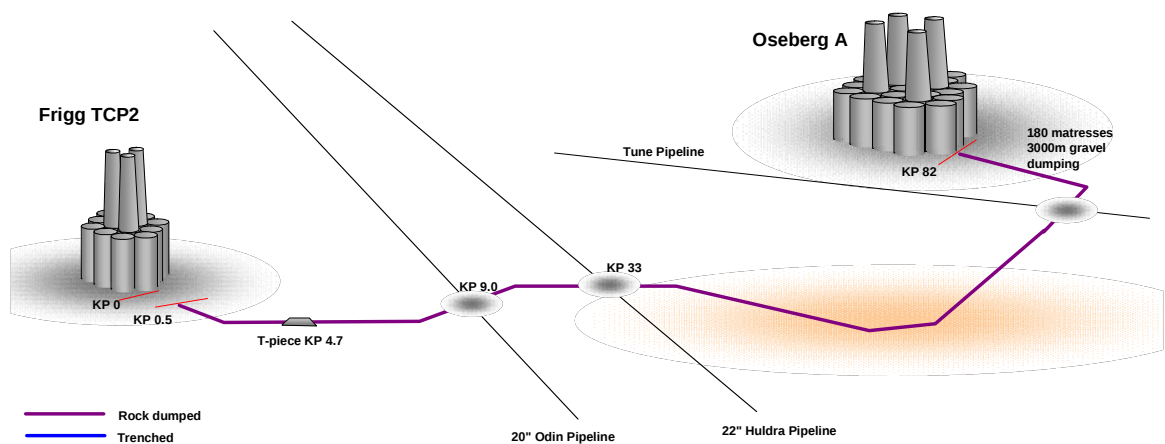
Leave in place but rock dump the whole line - final arrangement
